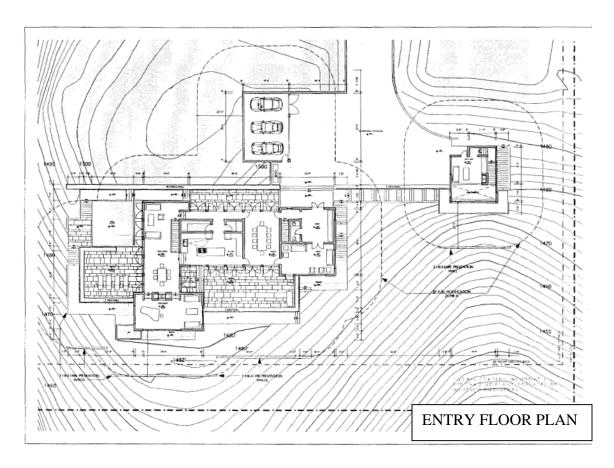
CDPA No. 4-05-153 Original and Revised Site Plan
